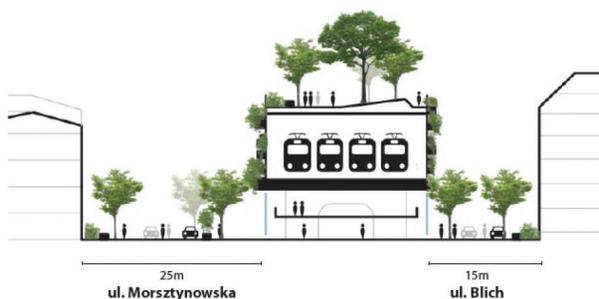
Development and construction plan for the area under the new railway flyover of the modernized cross-city route; cross-section – a fragment of the competition work, 1<sup>st</sup> award (Ton Venhoeven c.s. Architecten B.V., the Netherlands) [34]
